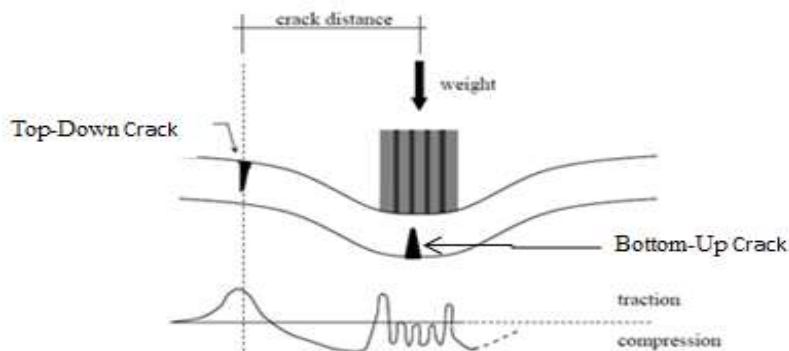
Mechanisms Failure of Fatigue Cracking
